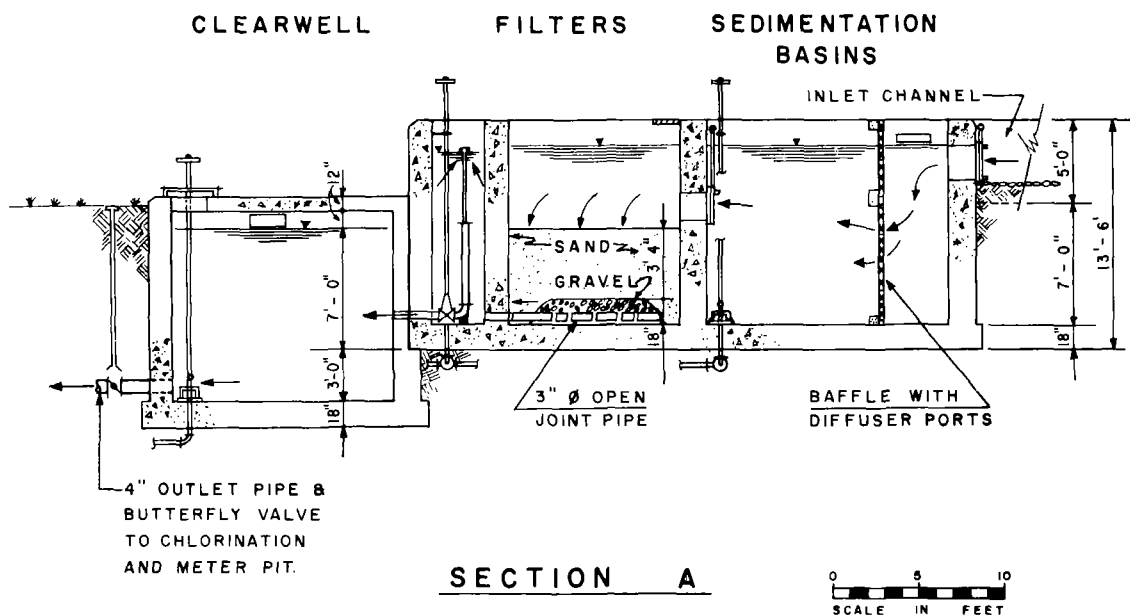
OROPOUCHE WATER TREATMENT PLANT — SECTIONS
